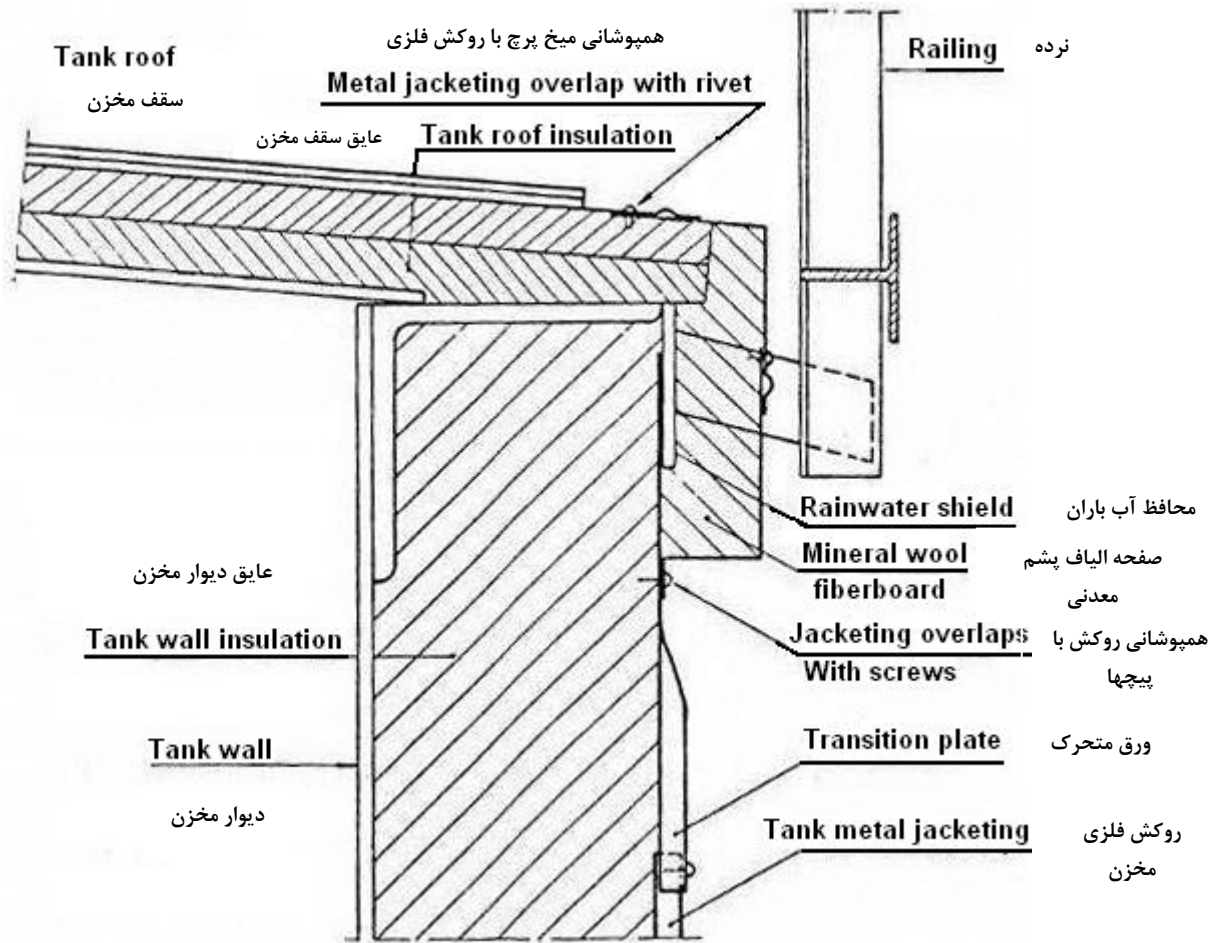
HANDRAILING ON INSULATED TANKROOF
